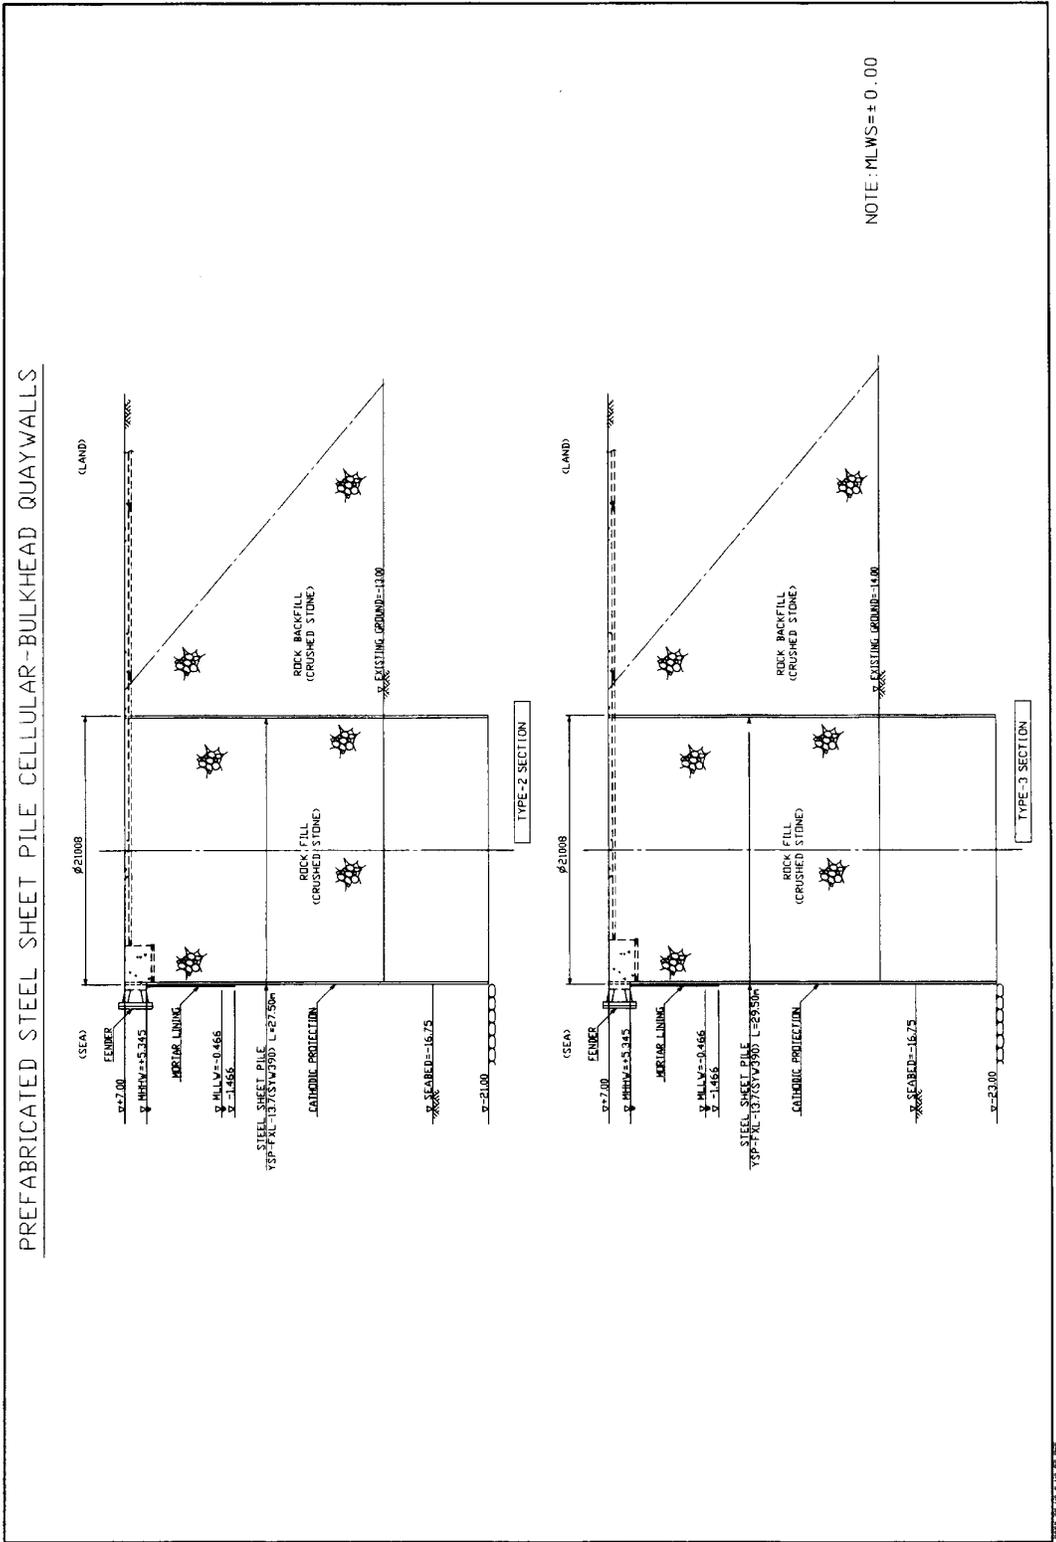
Section of Steel Sheet Pile Cellular-bulkhead Quaywall (TYPE-2,3)
